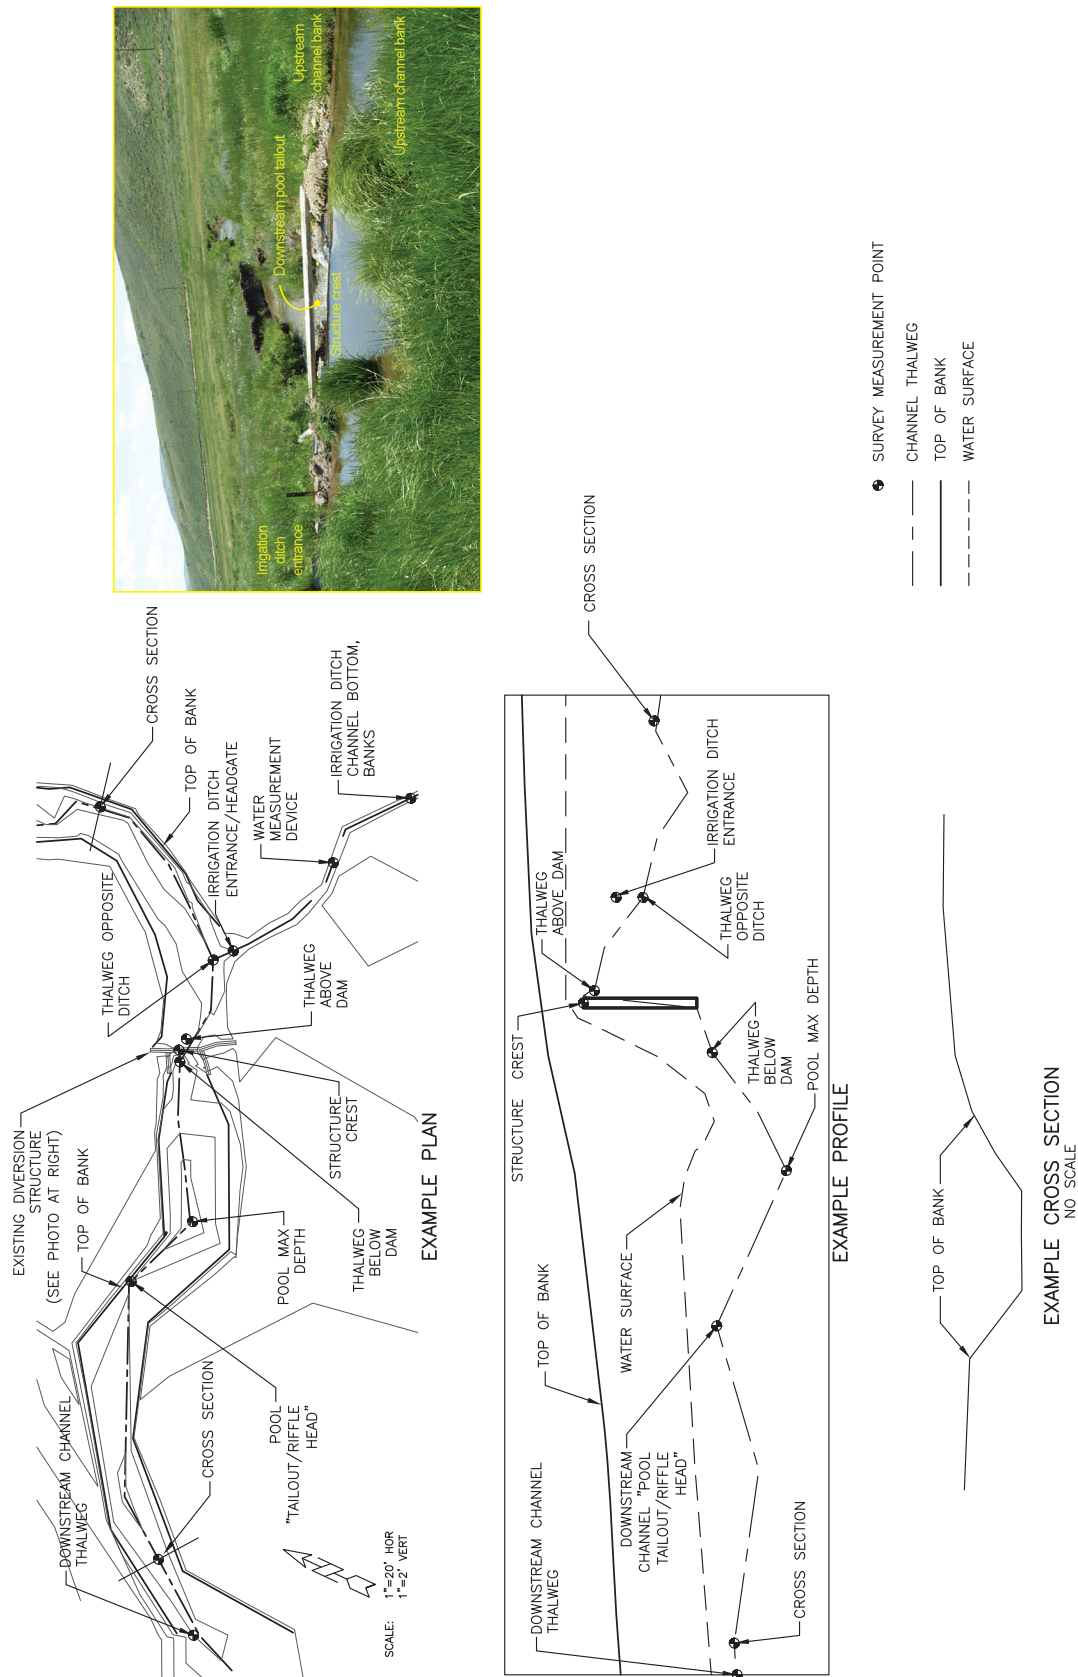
Example plan and longitudinal profile of existing diversion structure. This plan view shows contour lines from a total-station survey, but a careful sketch indicating survey points and any other important features is all that is needed at the planning stage. Add to the sketch observations of high flow lines, erosion, sedimentation, and so forth.
